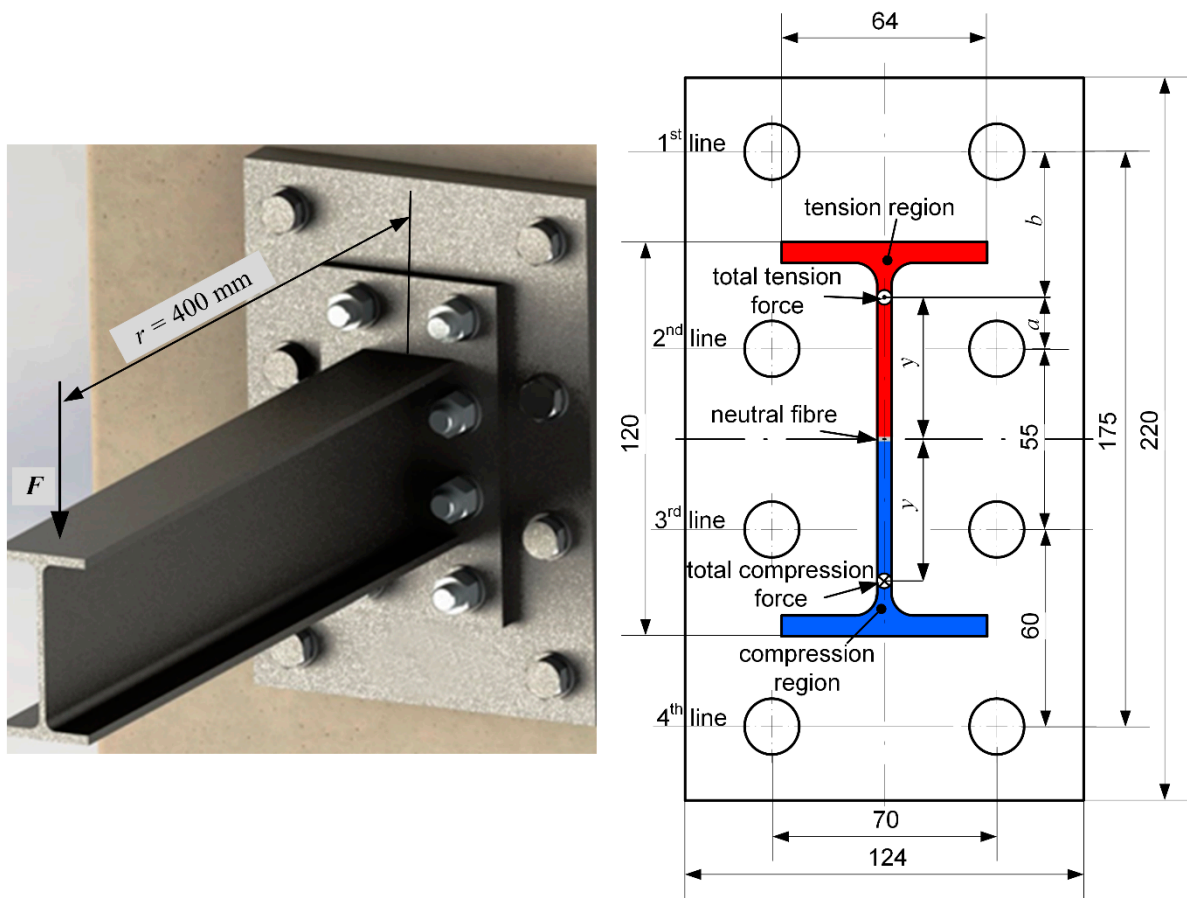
Layout of the bolts for fixing the end-plate connection; Adapted from ref. [13].
